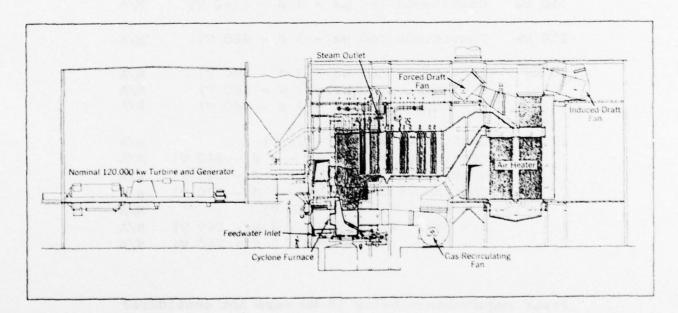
Typical design of a 120 MW oil or gas fired steam power plant - Babcock & Wilcox Co.
